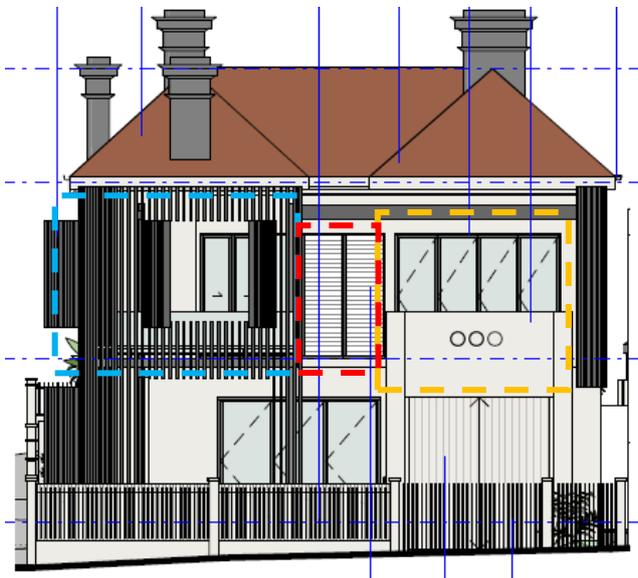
Rear (north) elevation, showing the northern side of the corner first floor balcony, the western rear balcony (in yellow), and glass louvres (in red)
